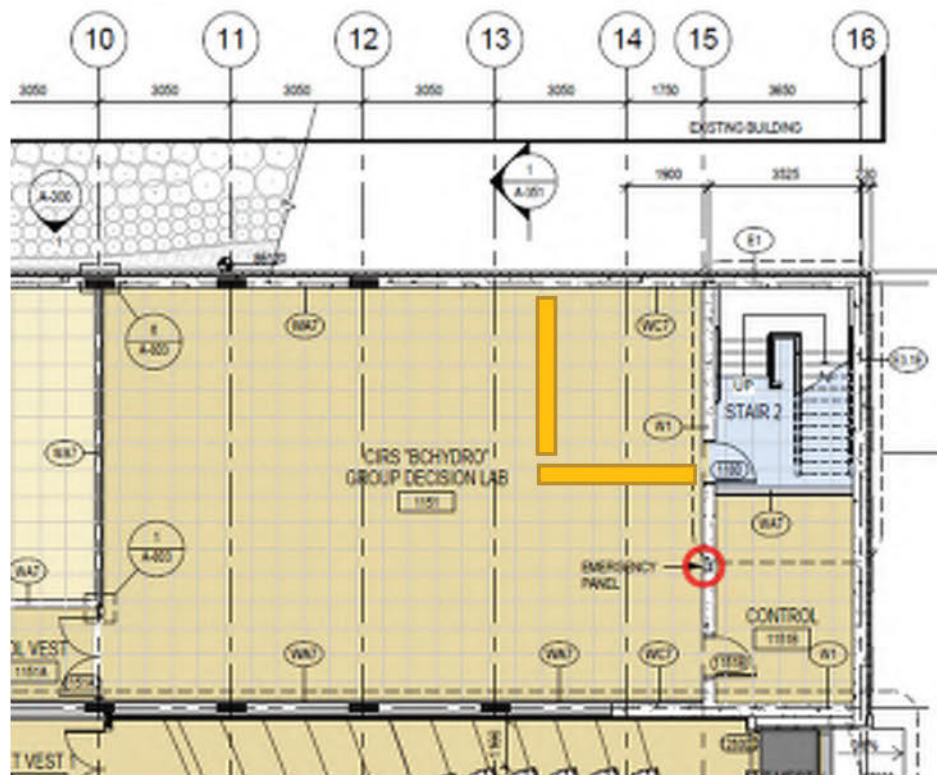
C: Plan drawing of BC Hydro Theatre at CIRSS, UBC showing LW-B installation (Perkins+Will, 2009)
